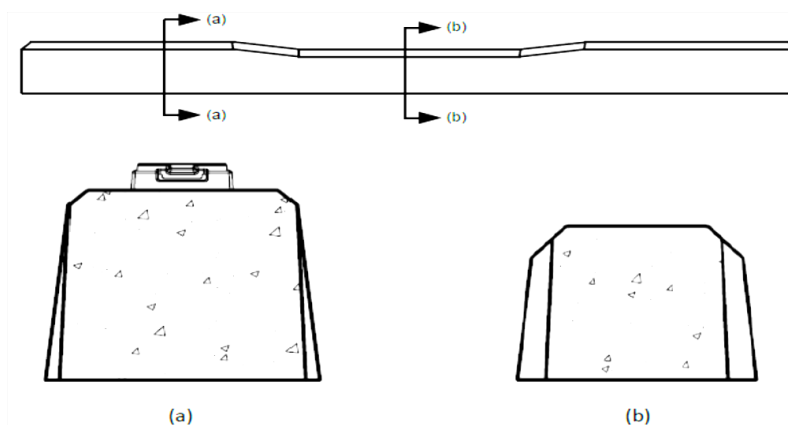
Typical tie cross section profile (a) rail seat section (b) center section [Lutch, 2009]
